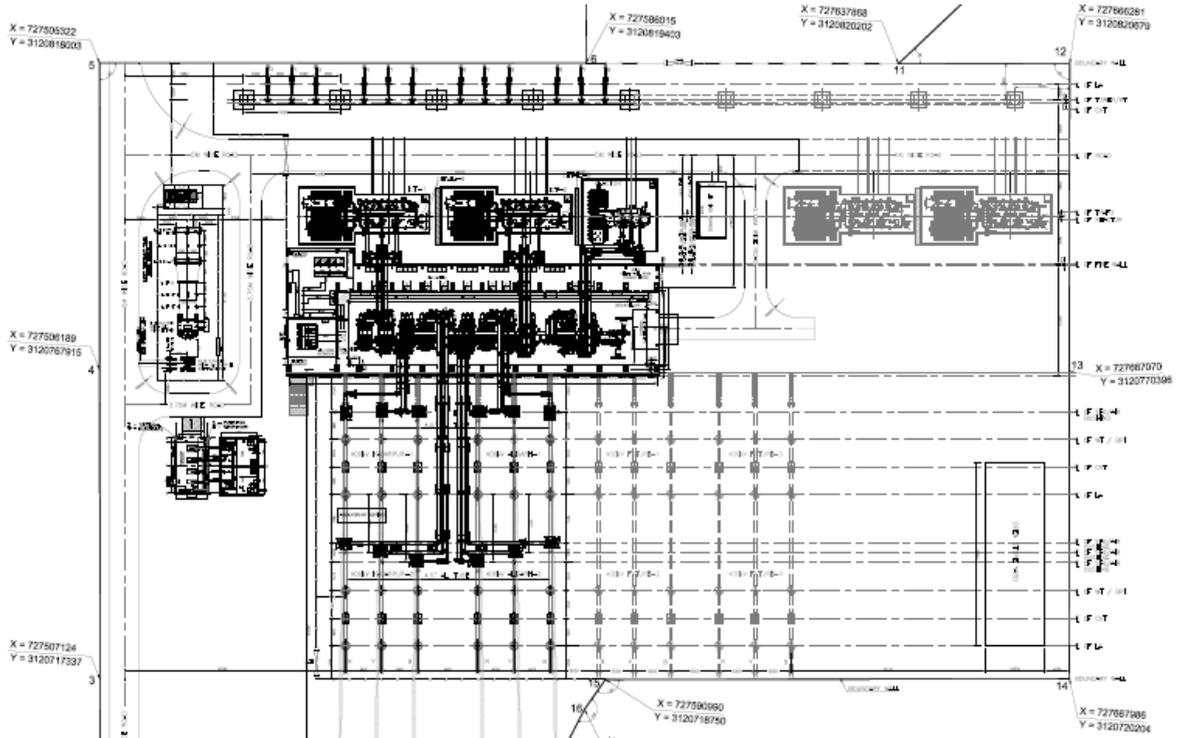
400 kV GIS Building (Ground Floor) Layout
